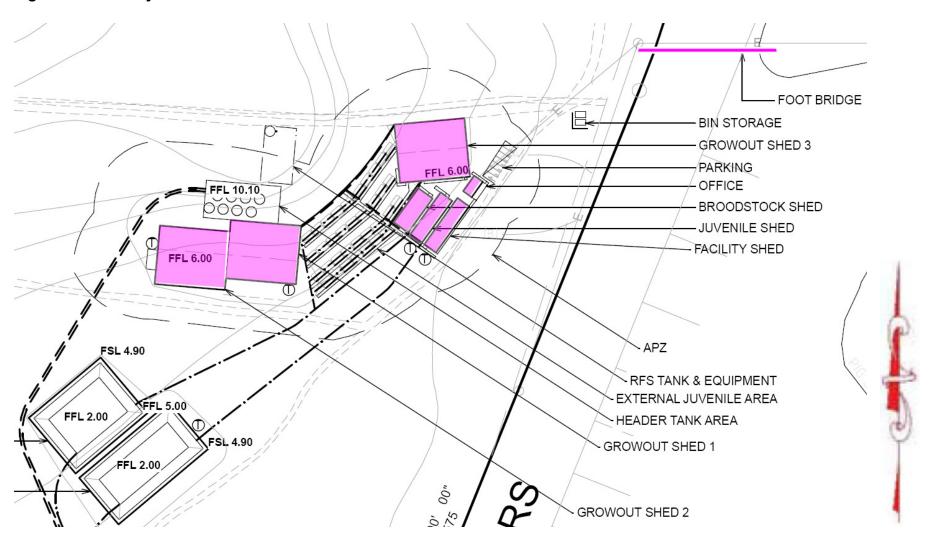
Detailed Site Layout Plan of the Pindimar Abalone Farm buildings.
